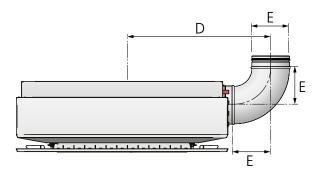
Connection with duct bend, end view Mounted connection fittings SYST CA xxx-90 PARASOL EX 690 MF/HF: D = 460; E = 125PARASOL EX 1290 MF/HF: D = 460; E = 125PARASOL EX 1290 PF: D = 495; E = 160
